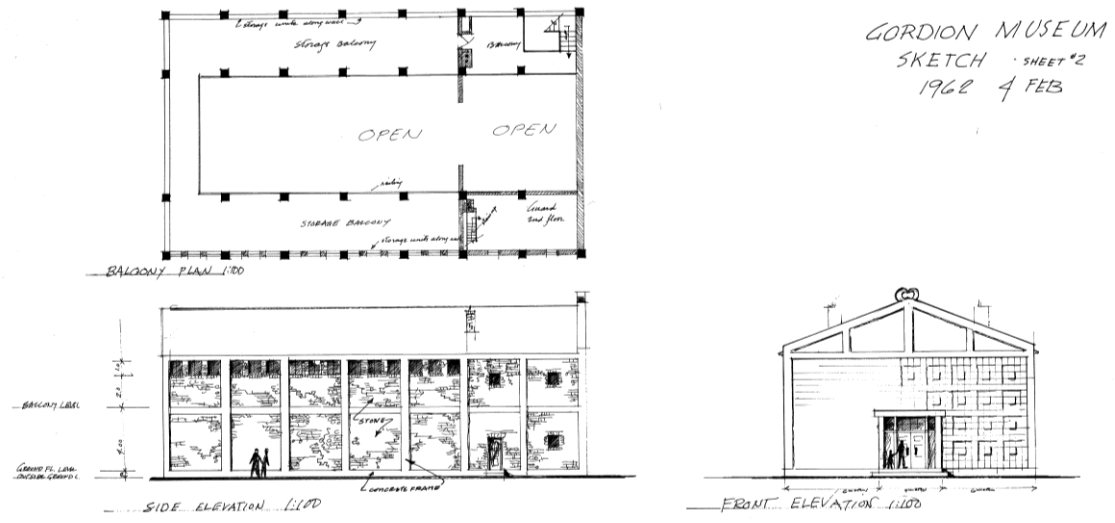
The balcony plan and the side and front elevations of the proposed museum, 1962.
